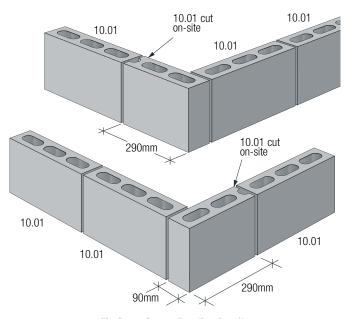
Corner Bonding Detail Utilising Cut-On-Site Corner Block
